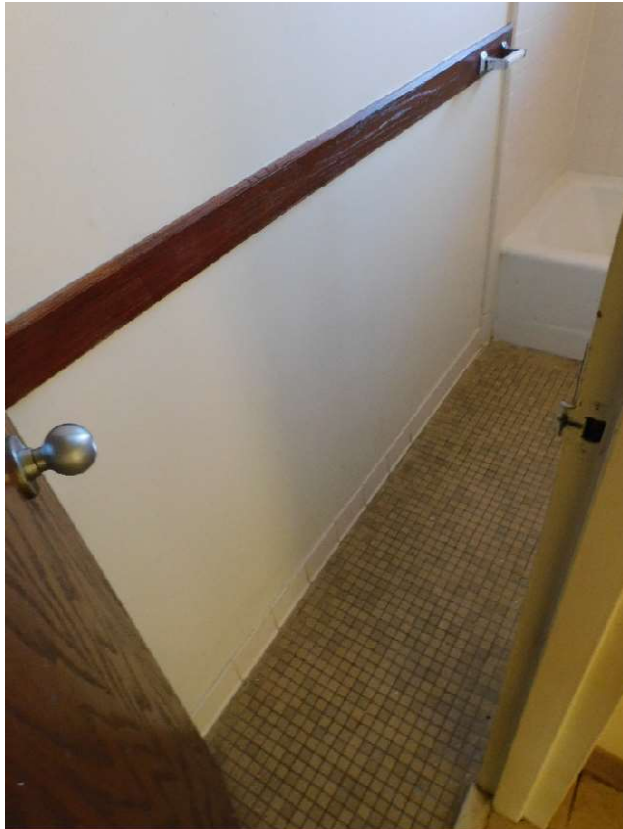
Dogwood Terrace Building 3A-2/Interior, typical bathroom.
